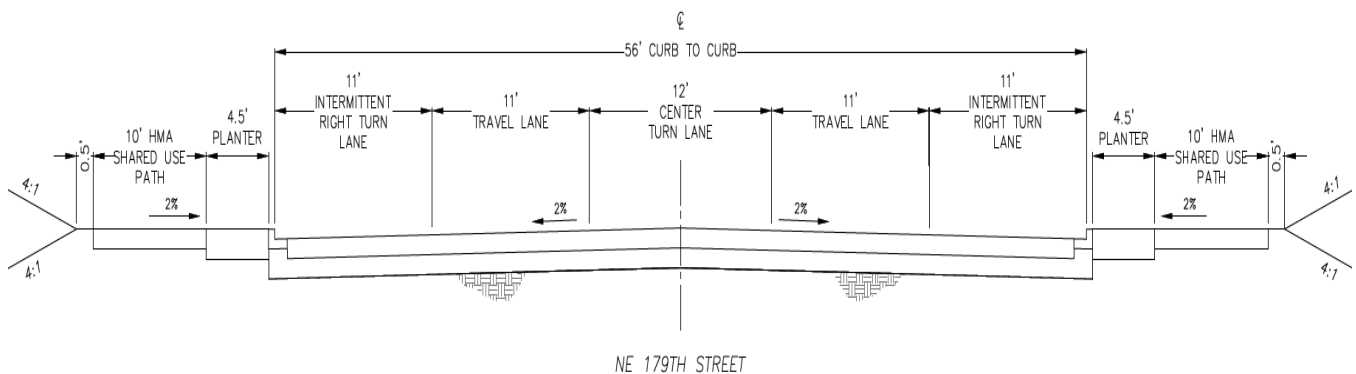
NE 179TH STREET PLANNED CROSS-SECTION
